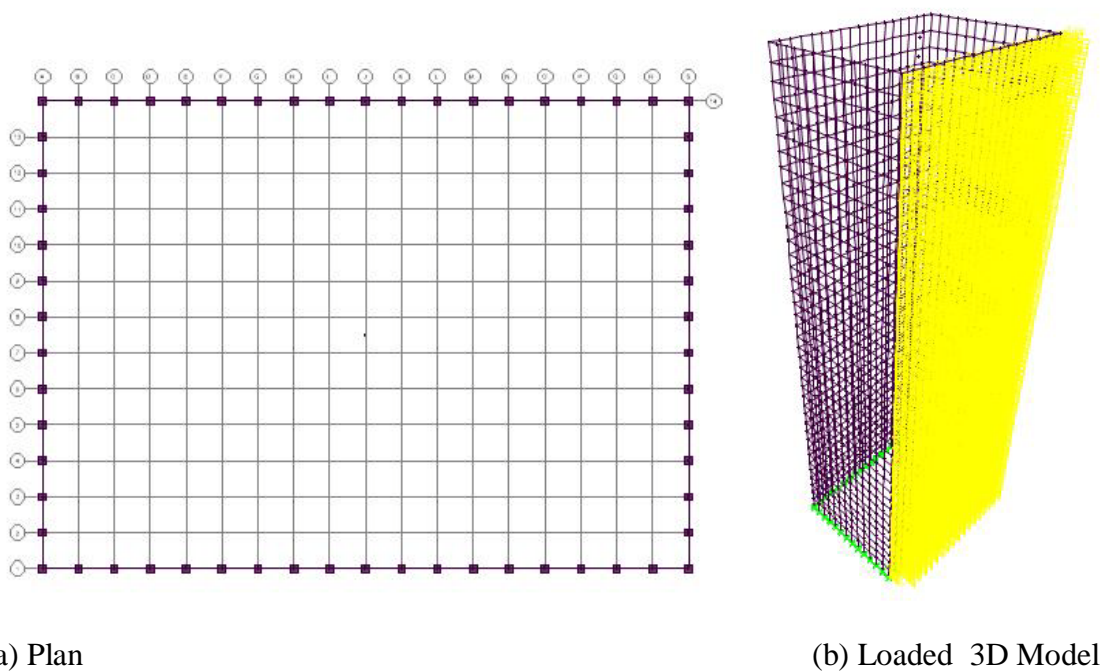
Plan & loaded 3D Model of Example Framed Tube Building
